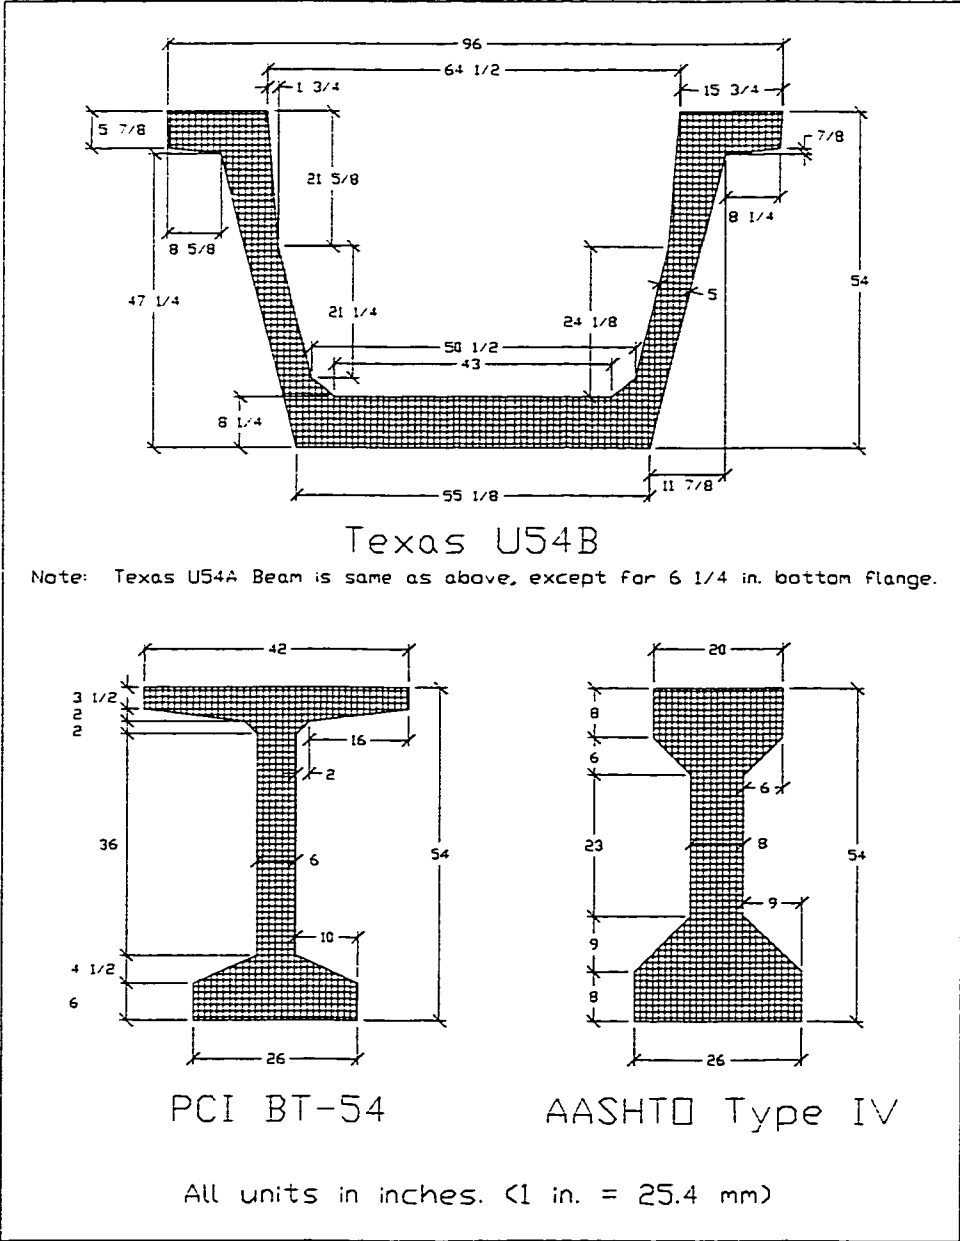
Selected 1370 mm (54 in.) Deep Girder Cross-Sections
